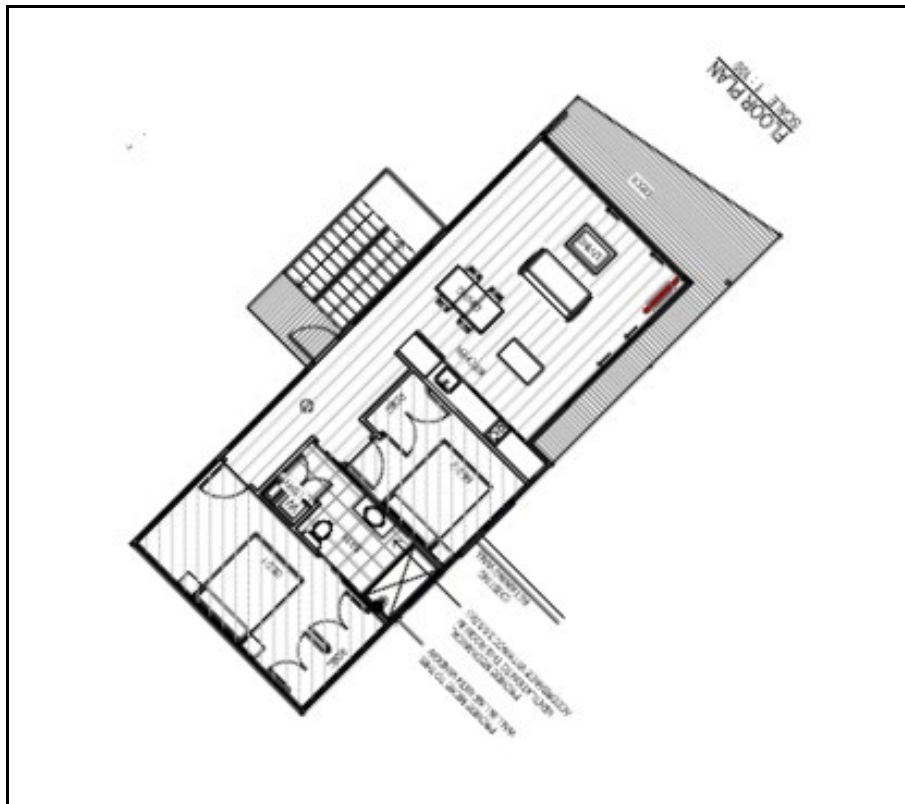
Proposed floor plan (Engineering Plus, 2021).
